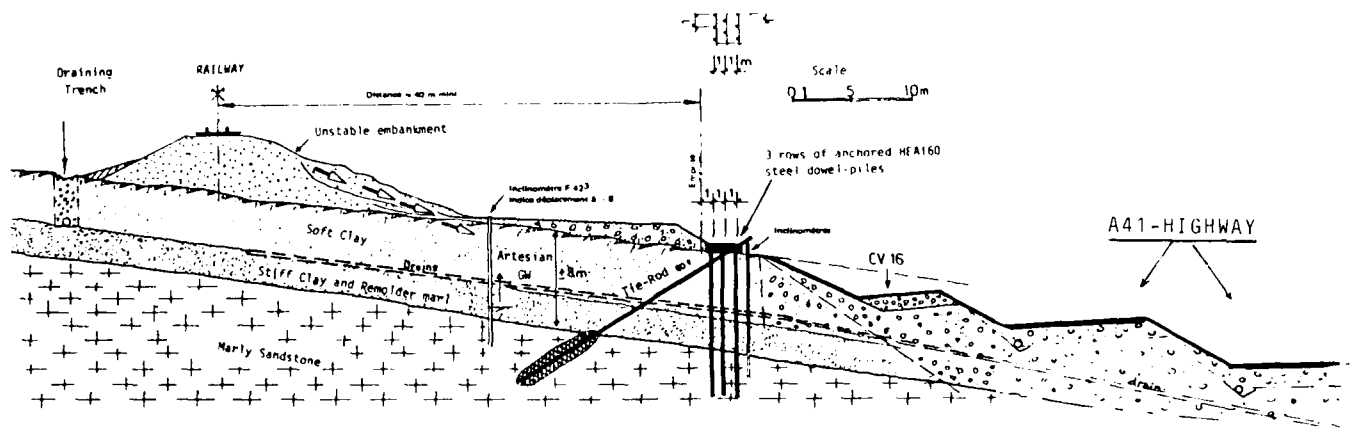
Soil profile at "Chez Louiset" Zone with soil reinforcement by anchored dowel-piles
